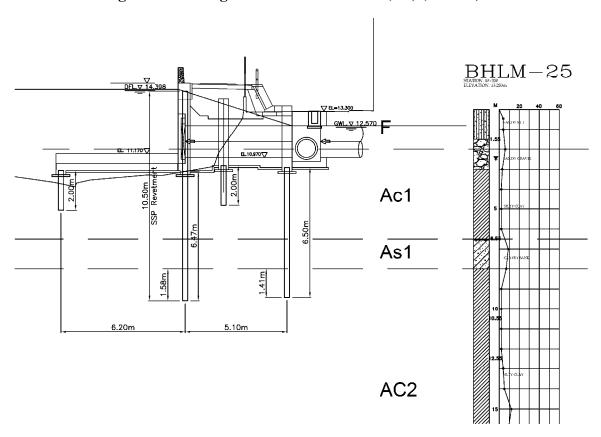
Length of SSP Cut off Wall (8/9) (MSR-3)
